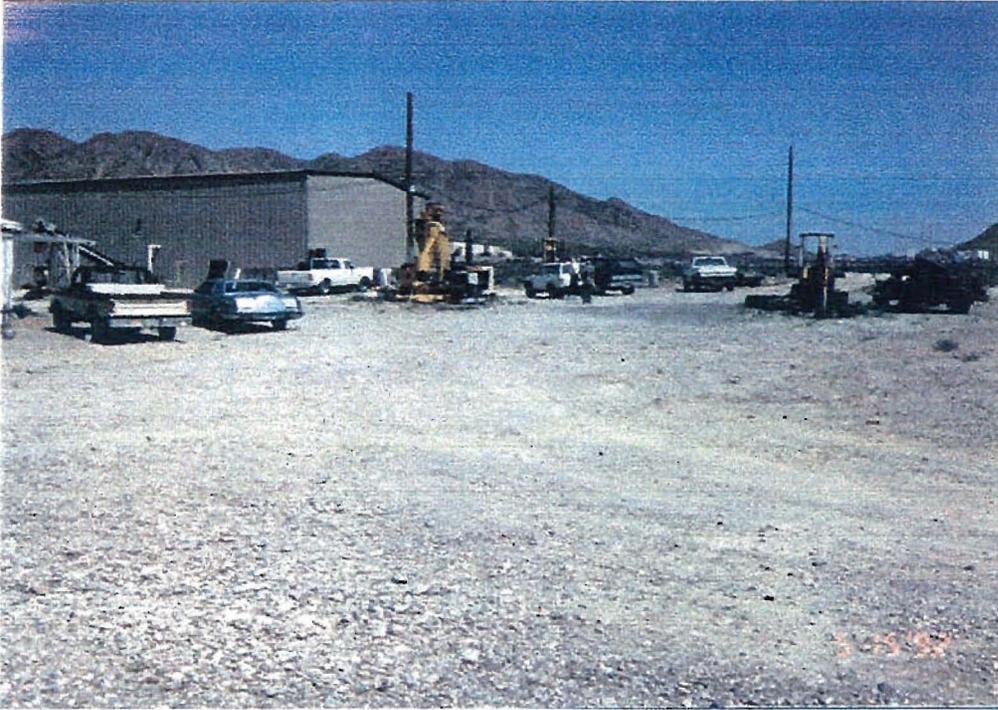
Taken by J. Mur 5/15/92. Looking northwest at mill building on the Becki M mill site.
